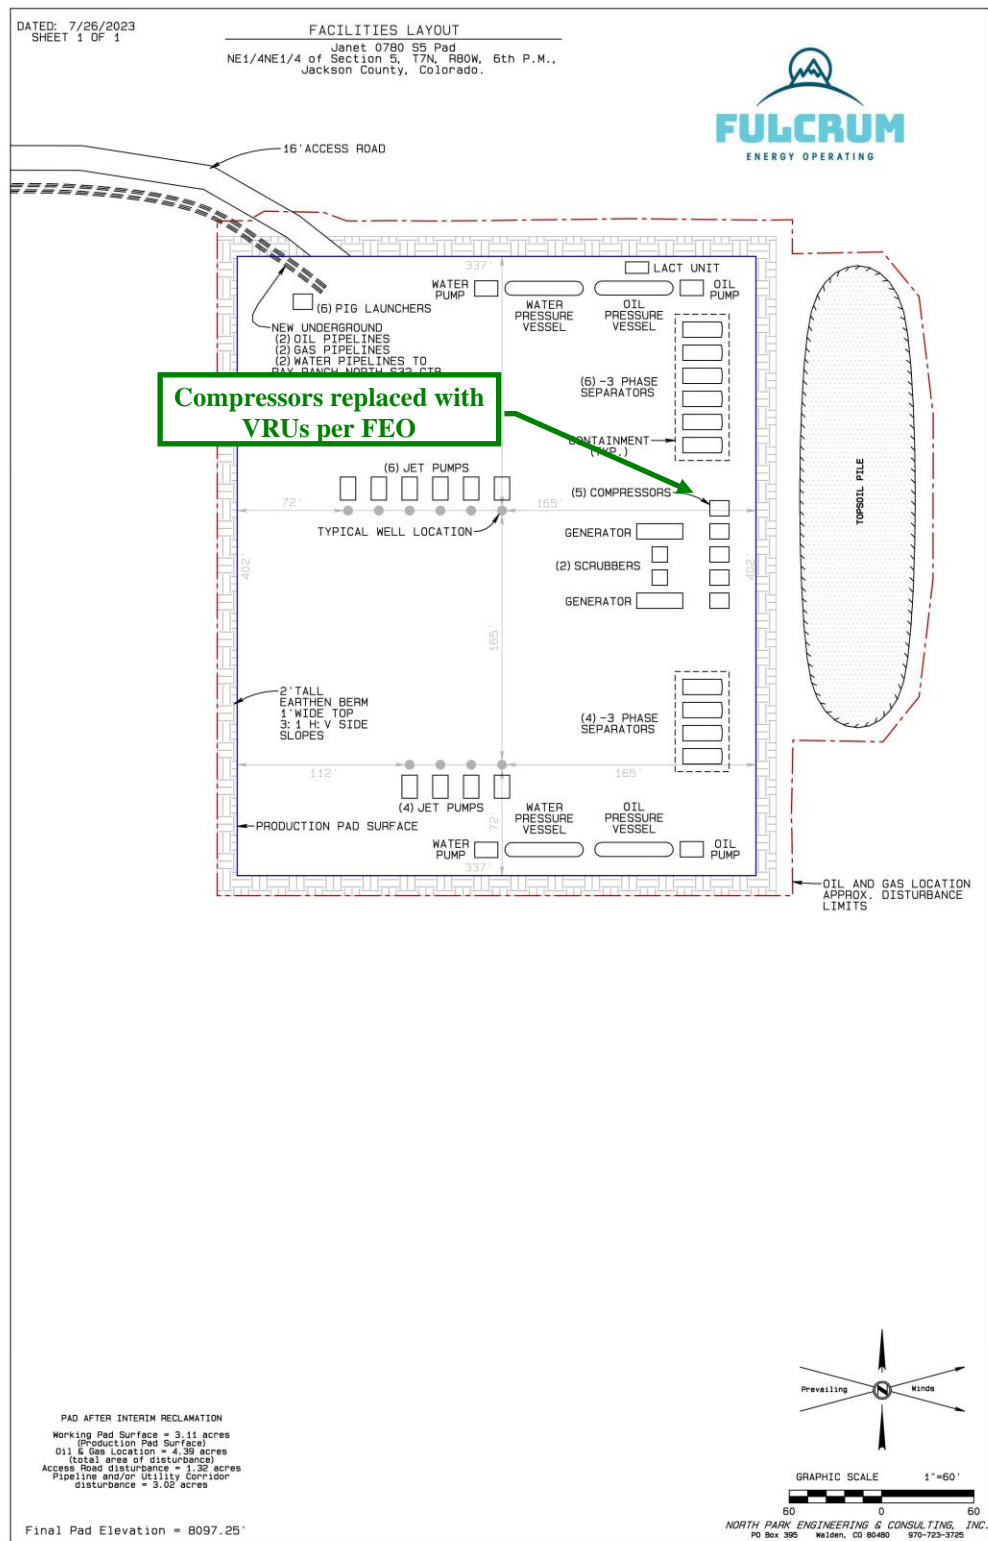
Modeled Janet 0780 S5 Pad Production Facility Layout
